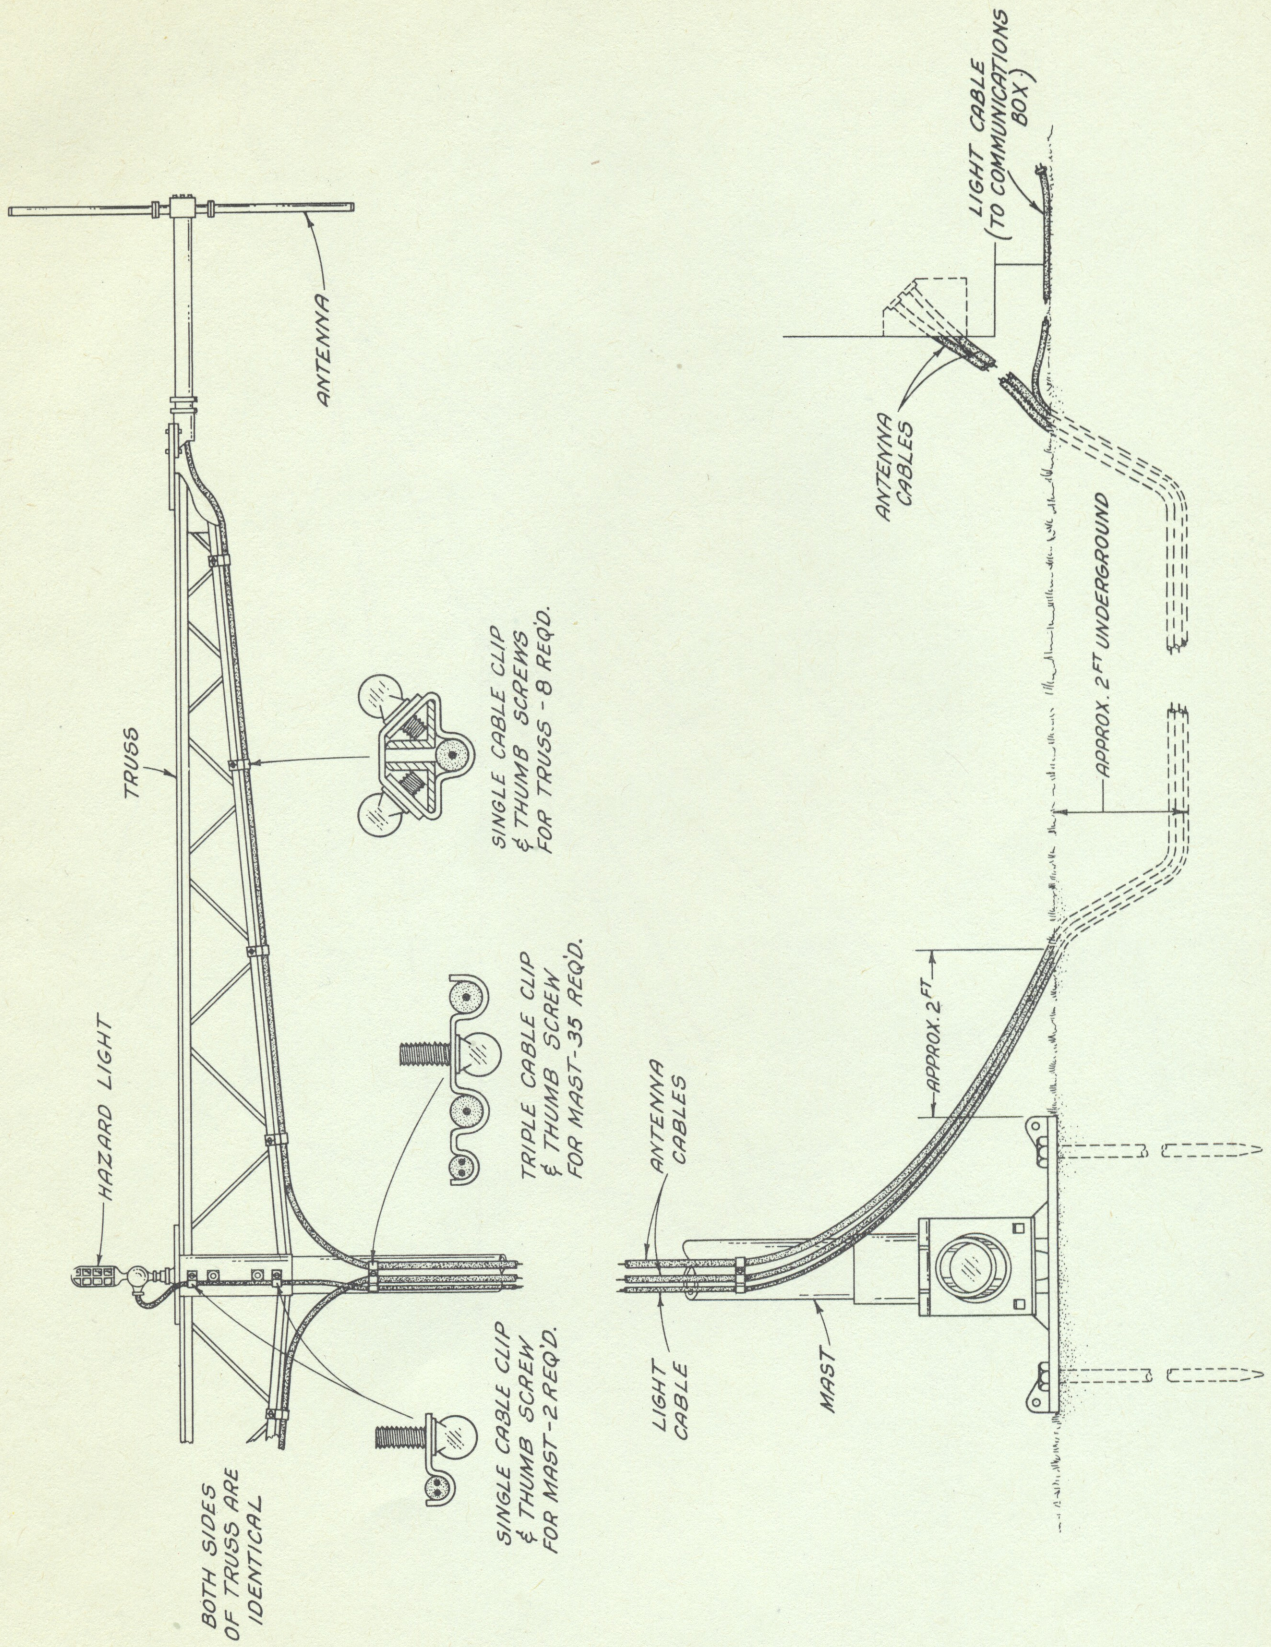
INSTALLATION OF ELECTRICAL EQUIPMENT
